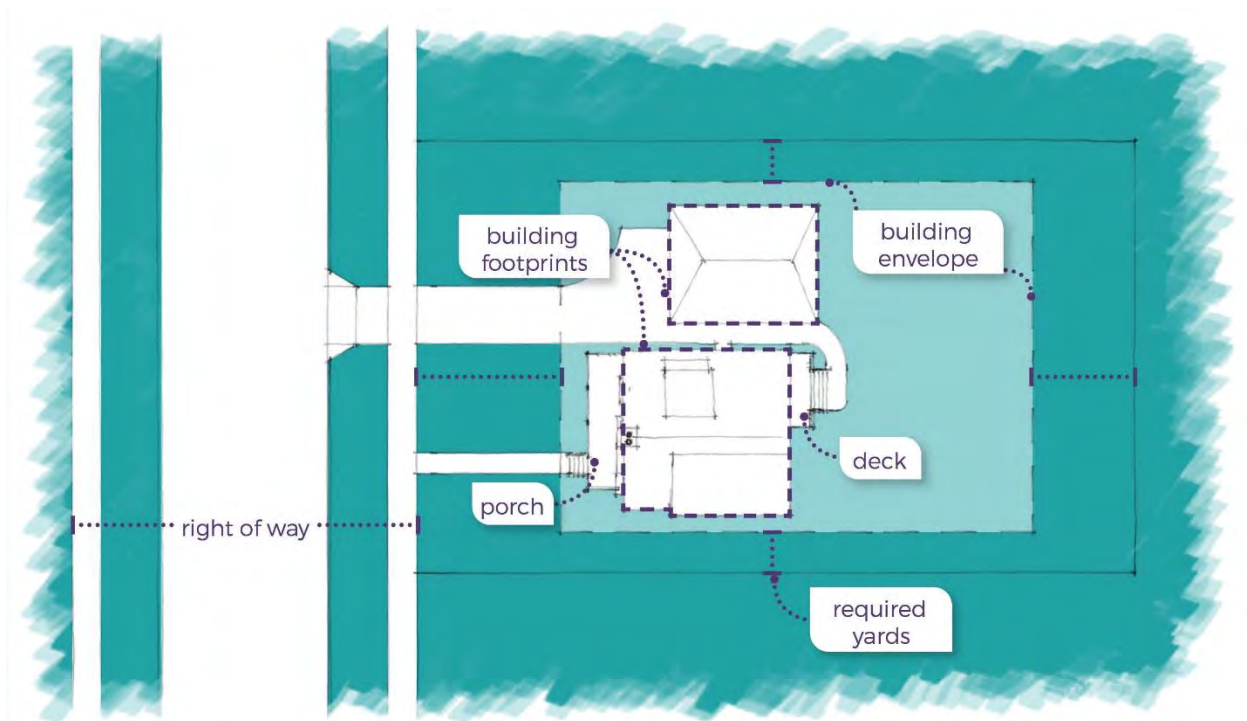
BUILDING ENVELOPE AND FOOTPRINT
